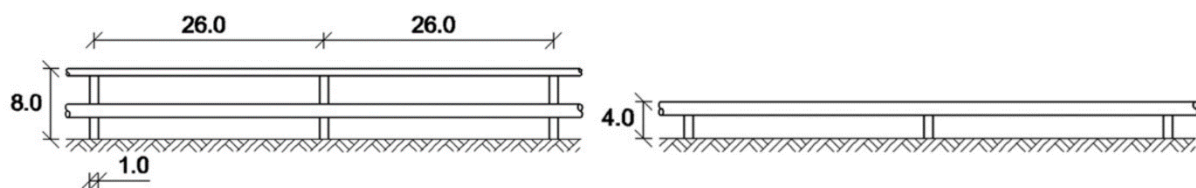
Schematic drawing of the two barriers tested in the wind tunnels, (A) Railing (B) Median divider. Image taken from [20]
